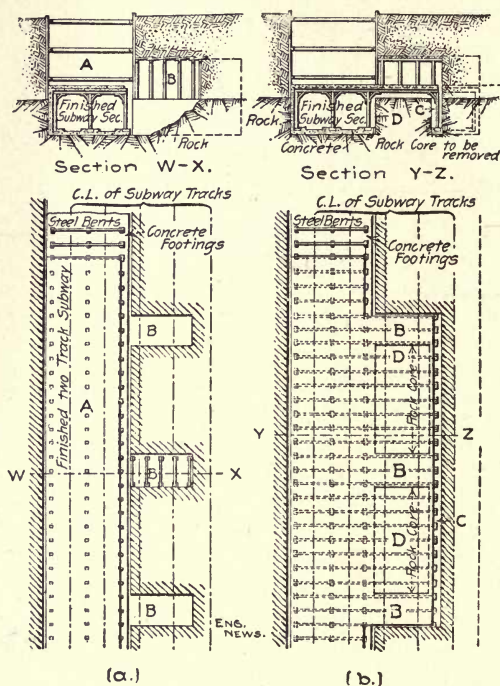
New York Rapid Transit Railway: Sketch-plan Showing Method of Excavation East of Fifth Avenue.
